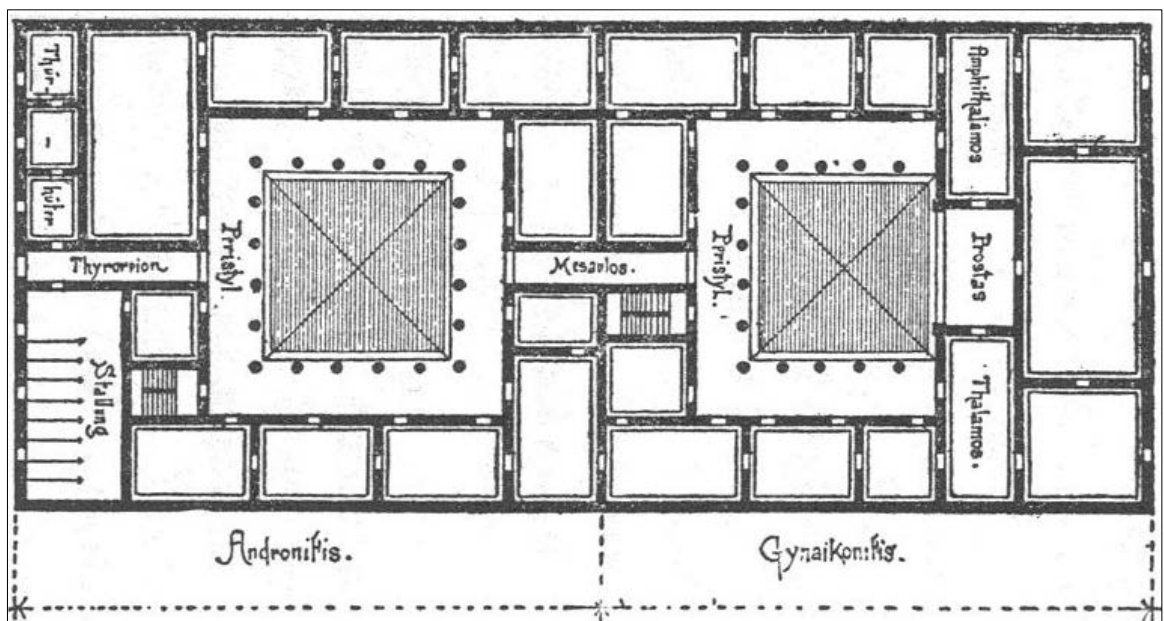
Greek house plan by Vitruvius (c 30 BC)
